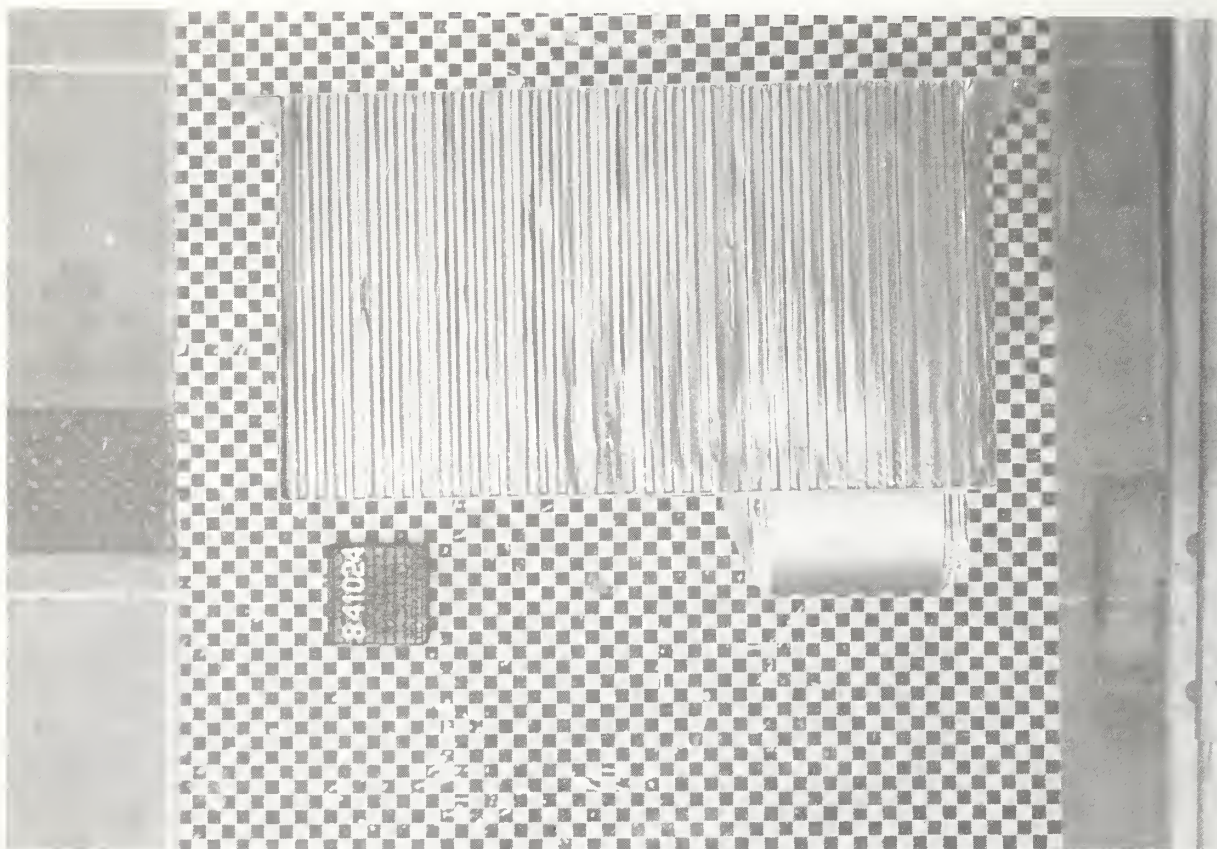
PRE-TEST MDB FACE -- VIEW 2
